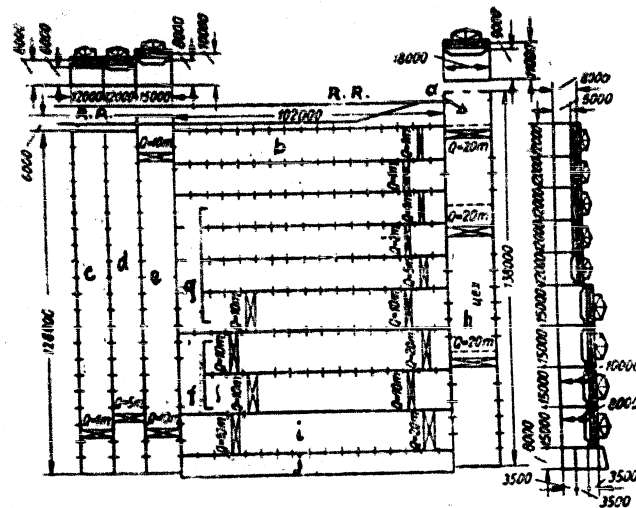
Plan of General Components in One Building of Mechanical, Assembly and Other Shops of Machine-Building Works
